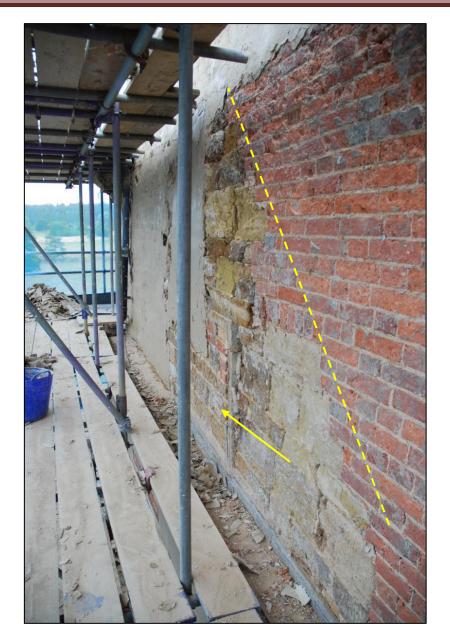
First floor blocked stone-mullioned window (arrowed) formerly looking east from Room F30. It looked out over the open site which would become the Victorian conservatory. Note the angle of the 17th-century stone gable.
